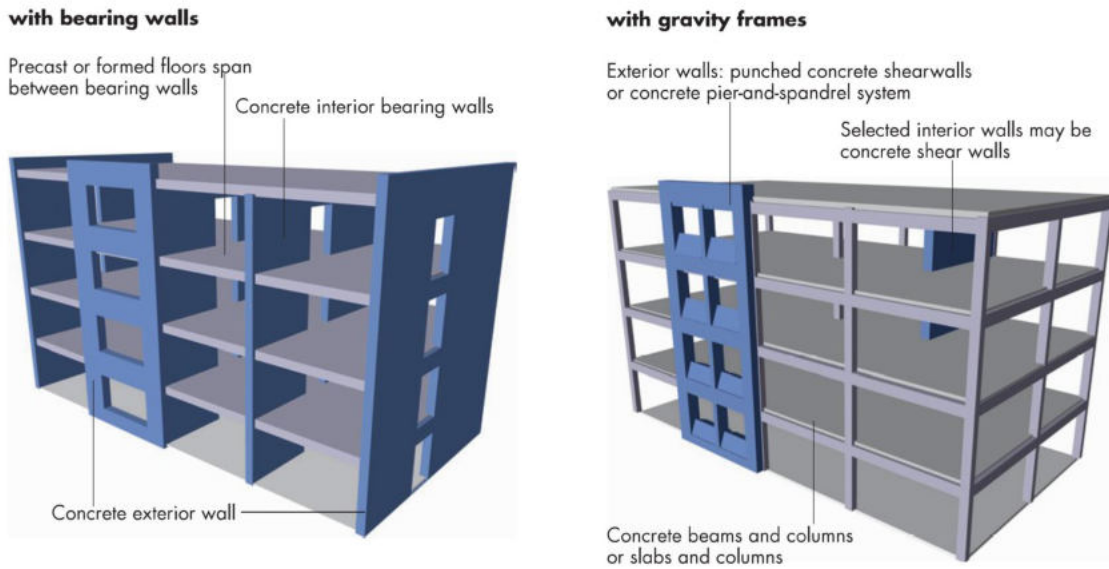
FEMA building type C2, concrete shear walls (adopted from [15])
